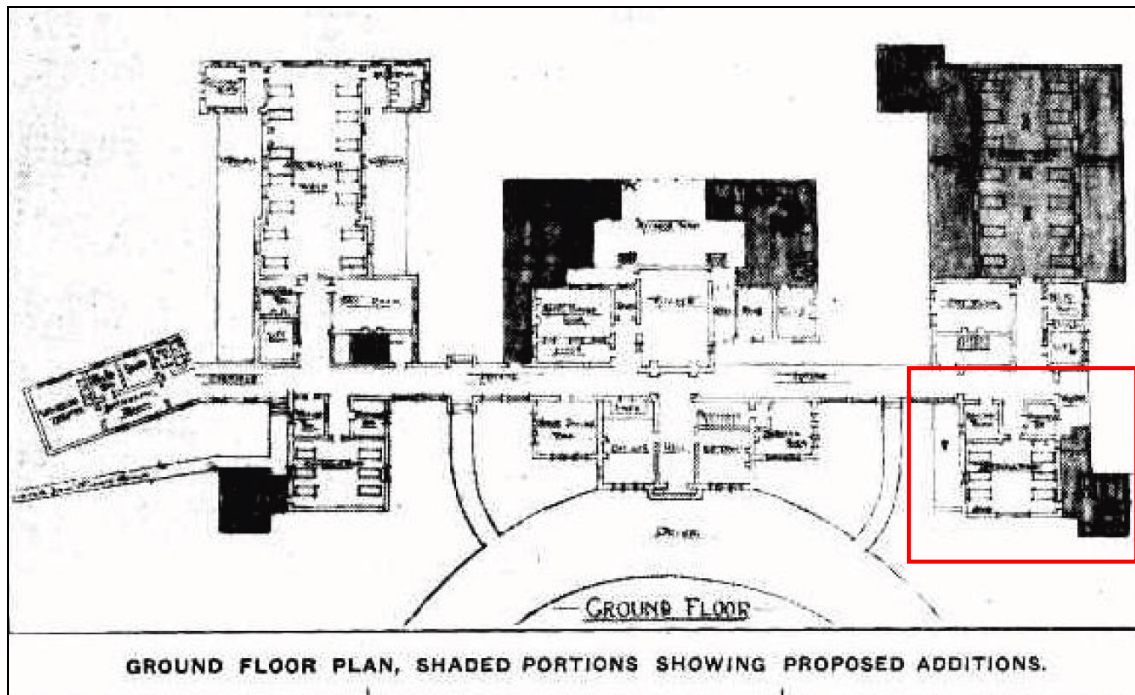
Ground floor plan showing the verandah addition on the eastern side of the western pavilion and indicating the proposed additions and ground floor layout of the Hospital and western pavilion at 1924. (Source: Trove, *Goulburn Evening Penny Post*, “Goulburn Hospital Building Fund Appeal”, Saturday 17 May 1924, p. 6)
